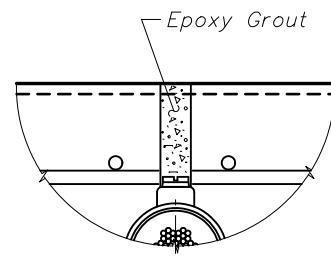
DETAIL A - FACE INSPECTED ANCHOR WITH GROUT OUTLET
